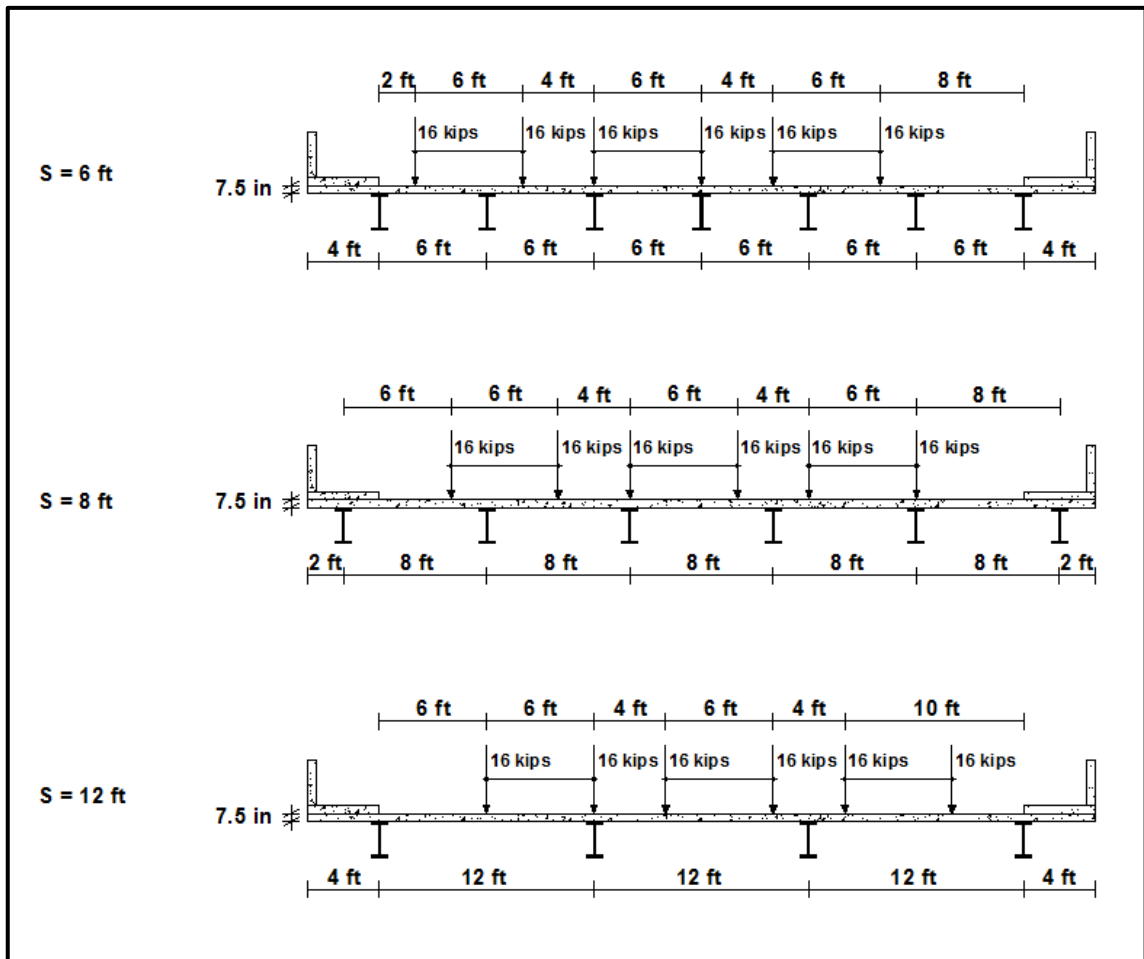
Typical Cross-Section of Three-Lane Bridges (Case 2SR) and The Critical Transverse Position of HS20 Trucks for the different Girder Spacing Considered (Nuwayhid et al. 2015)
